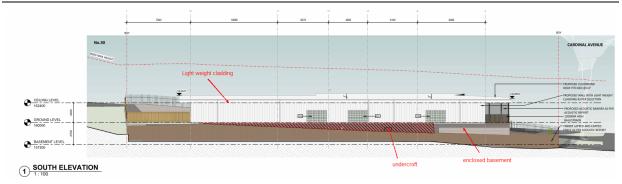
Extract of South Elevation (Source: Audaa Pty Ltd)
